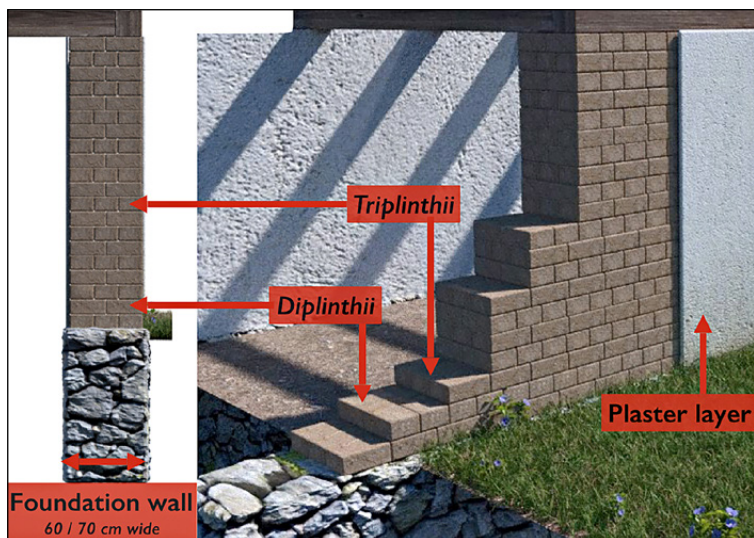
Mud brick walls on stone foundations and superficial plaster layer.
